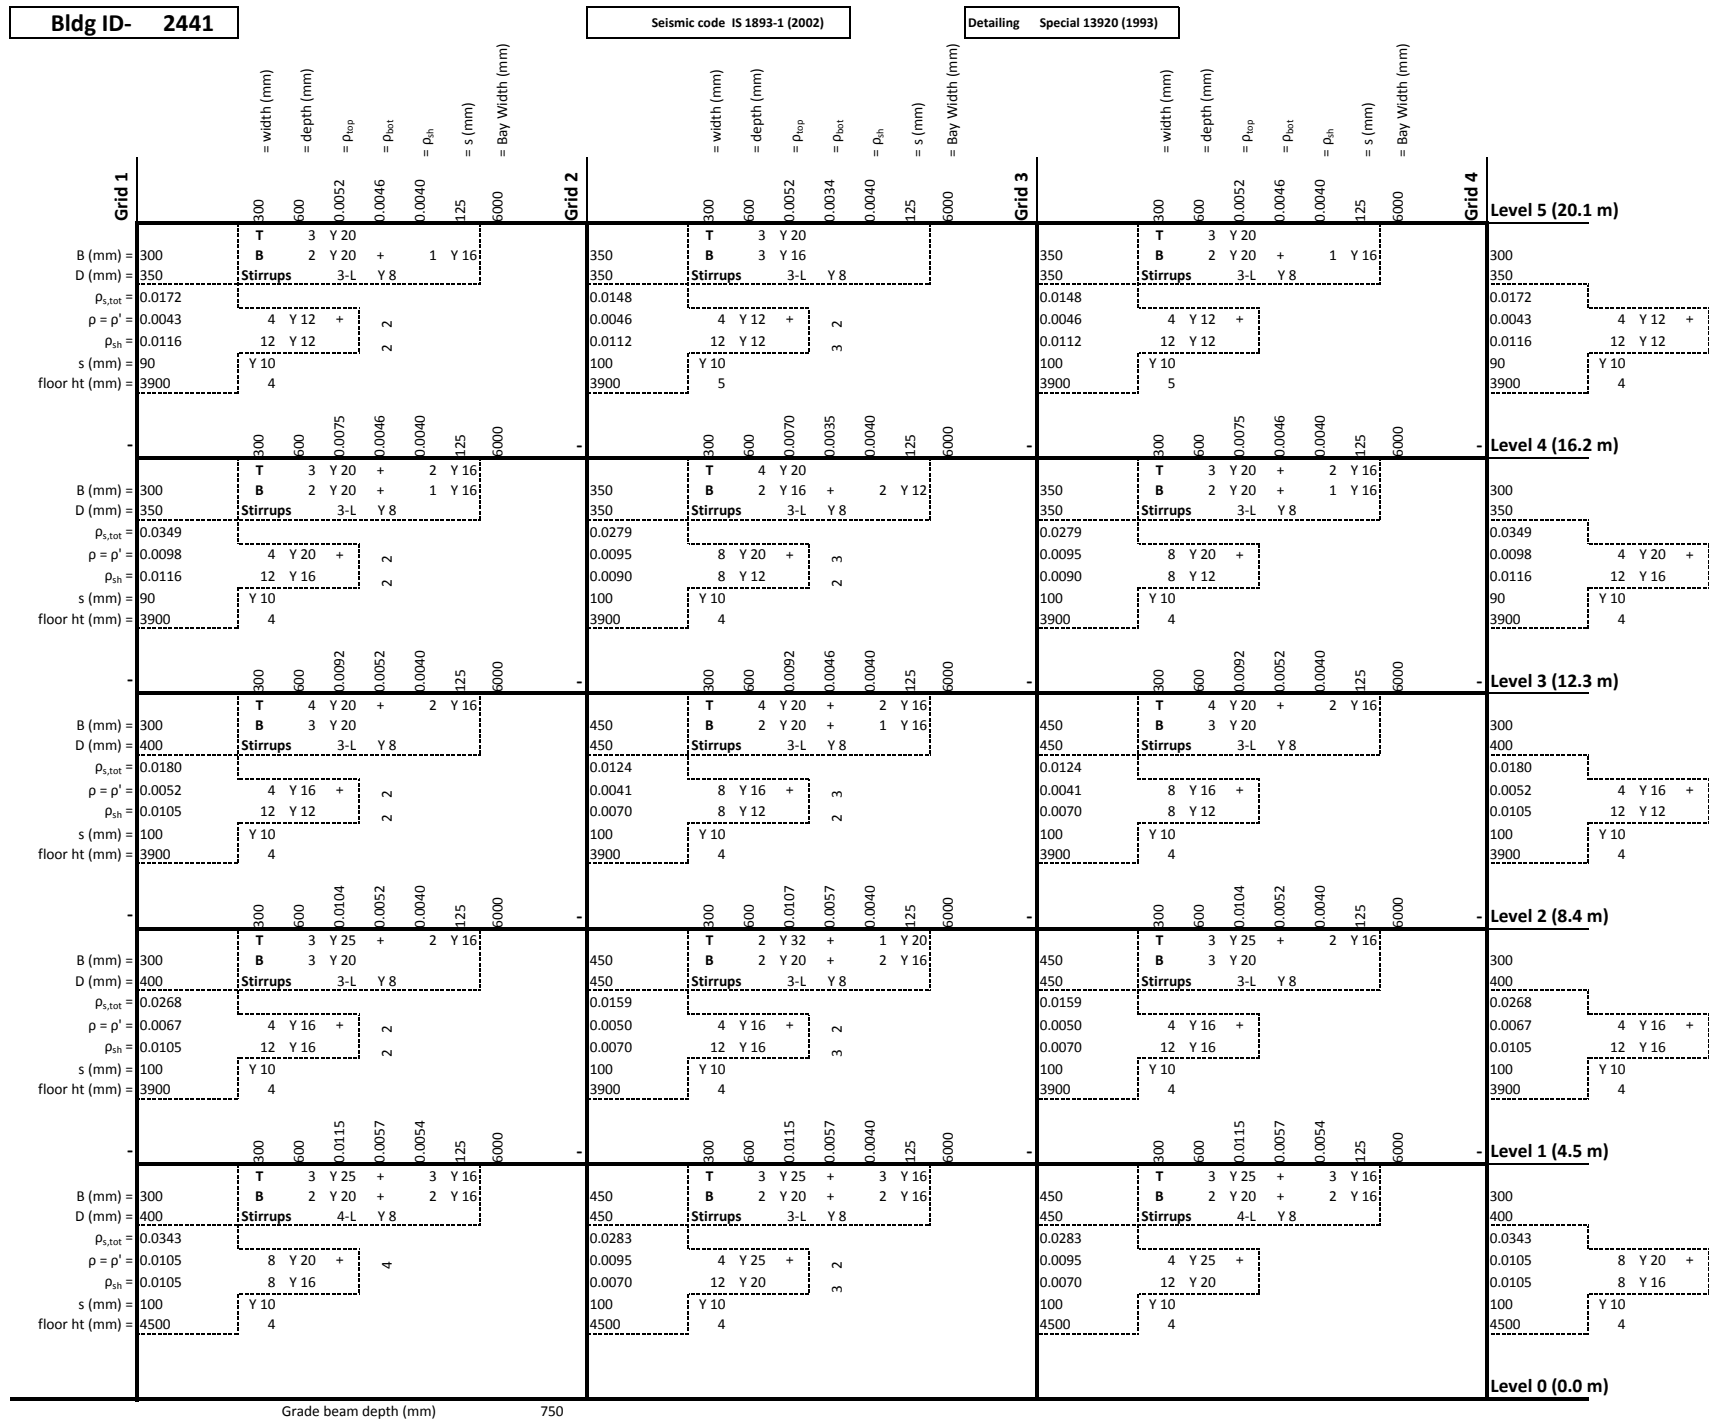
Provided reinforcement and modeling details for building ID 2441
